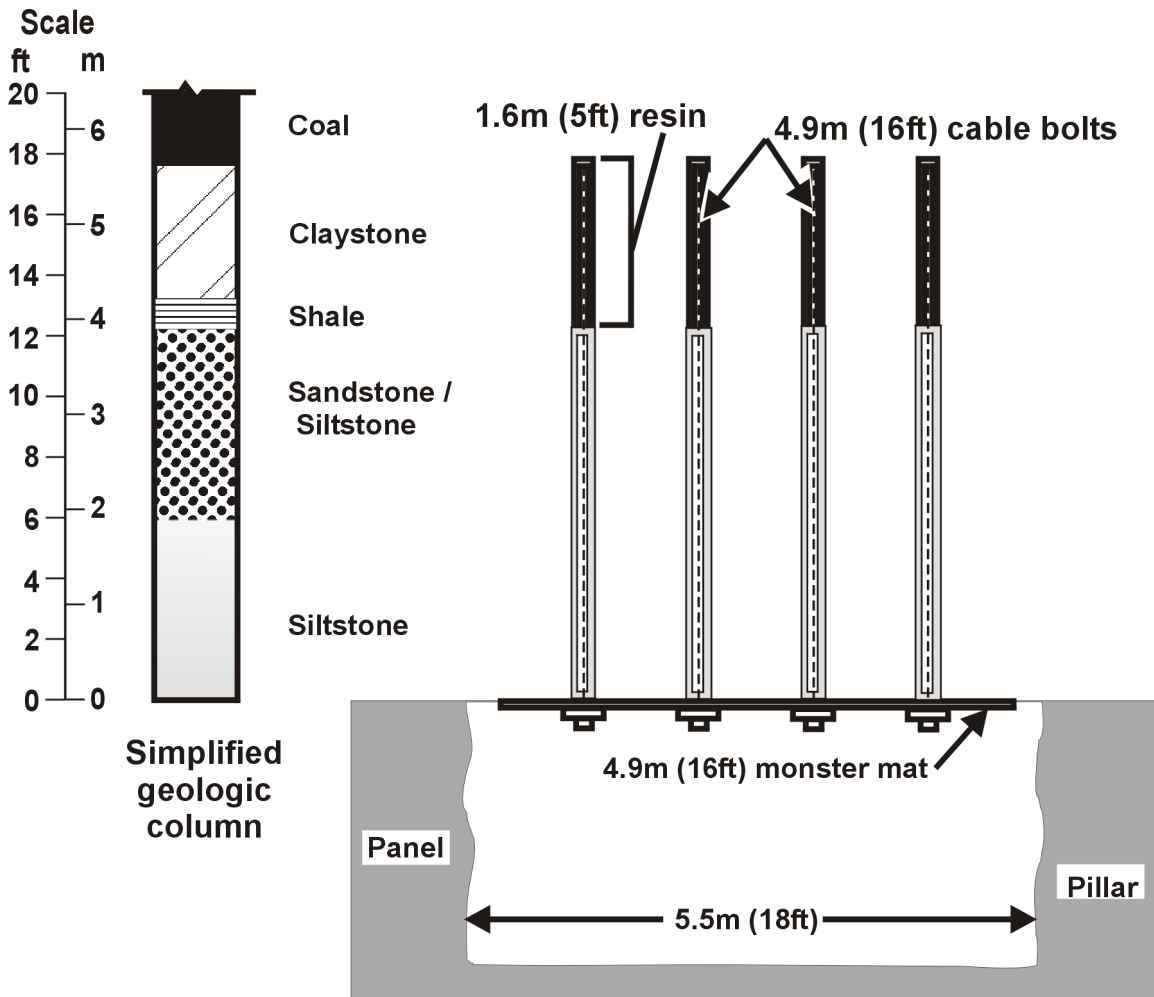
Cross section of tailgate entry showing cable bolt design for case history 3.
